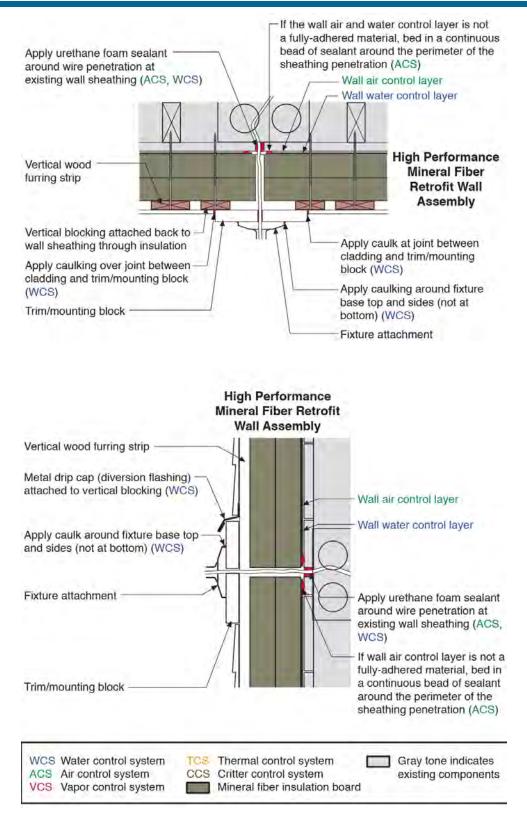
Schematic plan (above) and section (below) details for wire penetration and fixture mount in a high performance mineral fiber retrofit wall assembly
